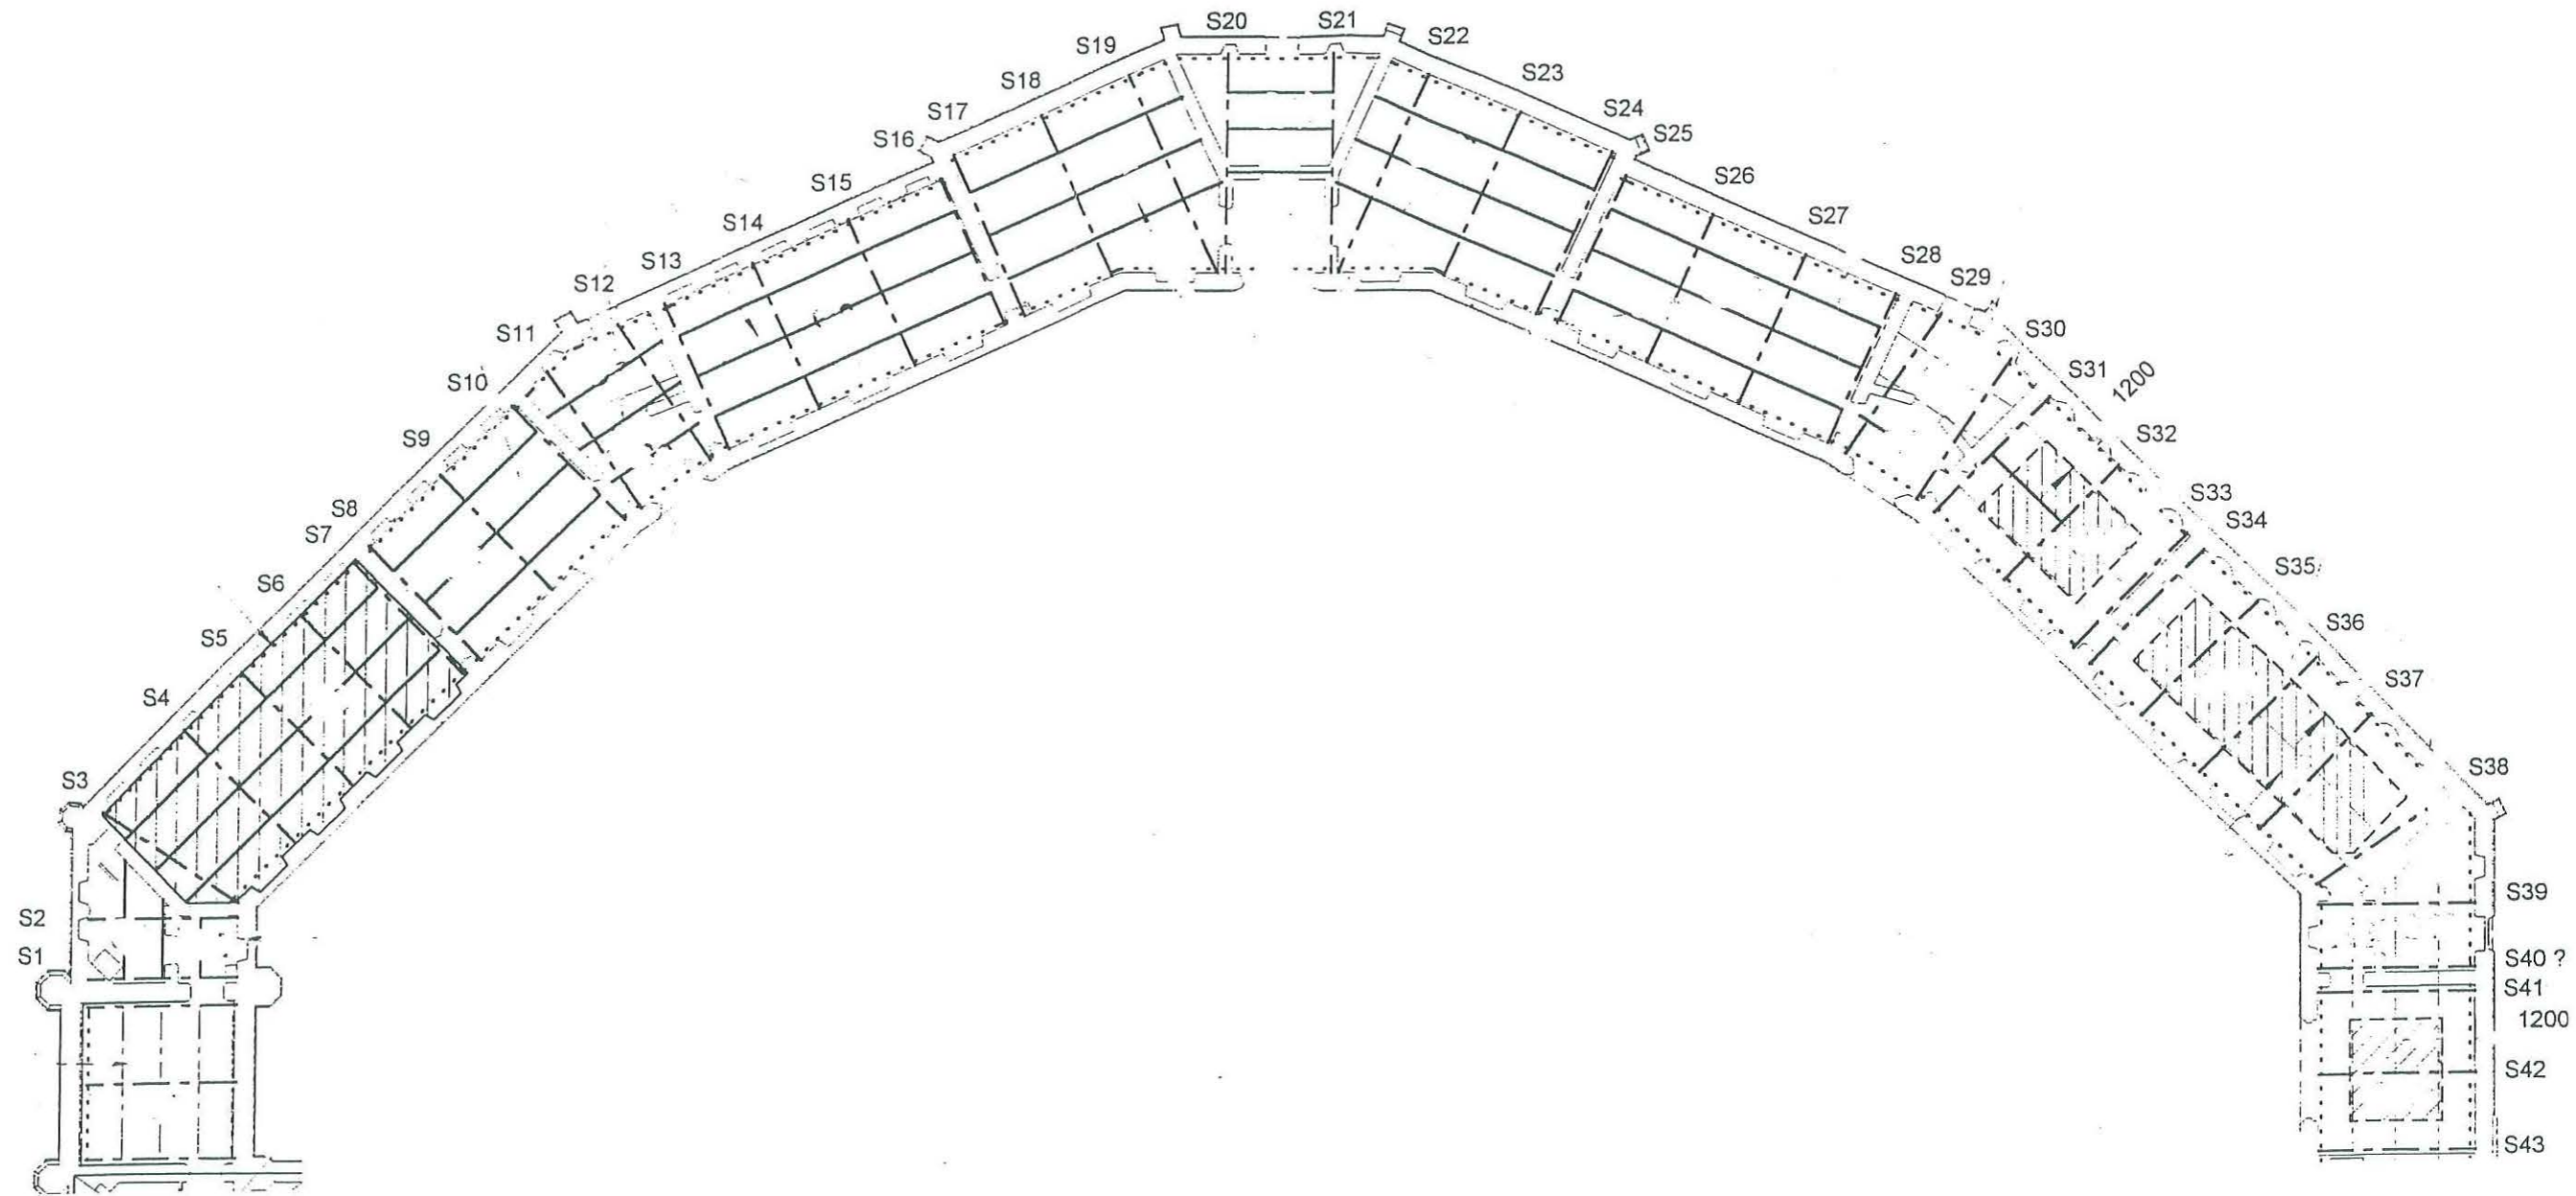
Drawing to show positions of samples from the trusses of the stable roof
